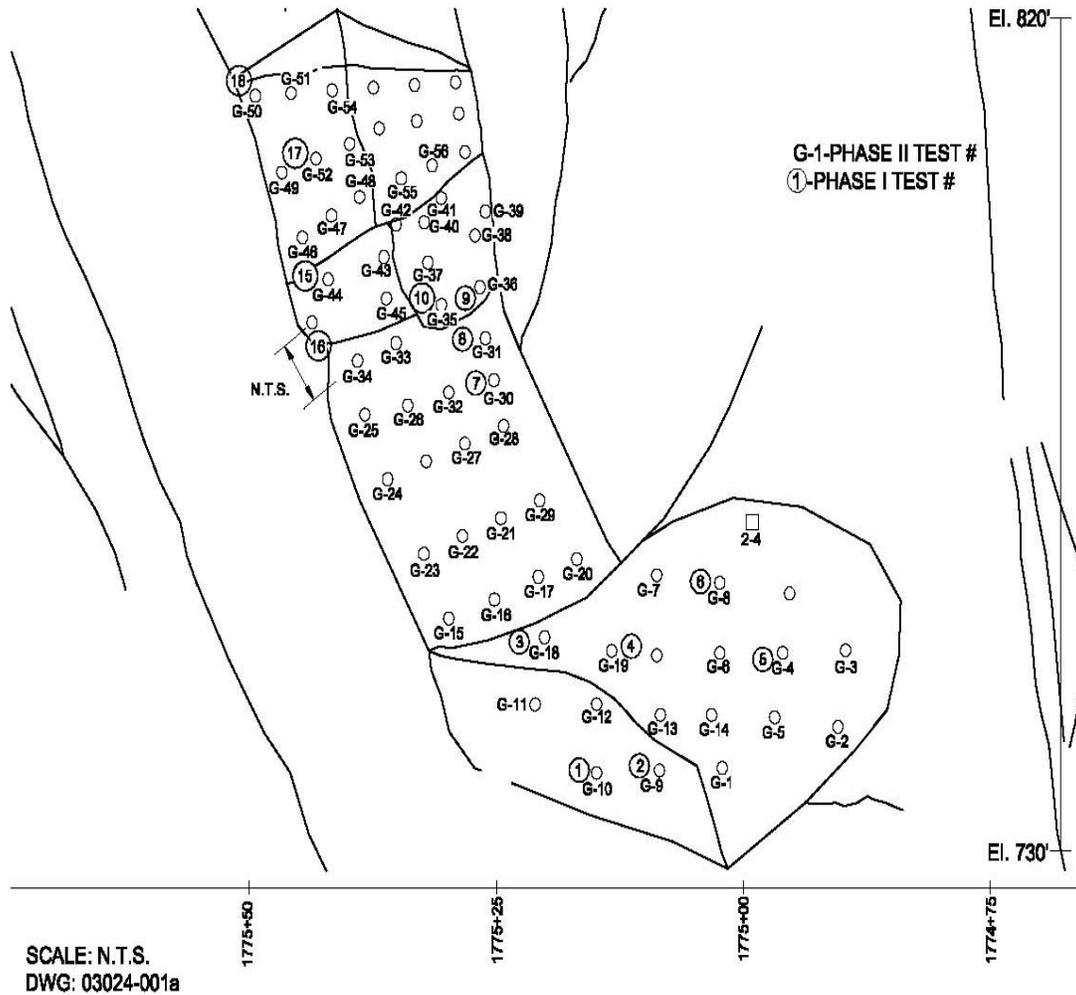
Rock Face Elevation View with Stationing, Reinforcement Locations, and Test Numbers for Phase I & II
